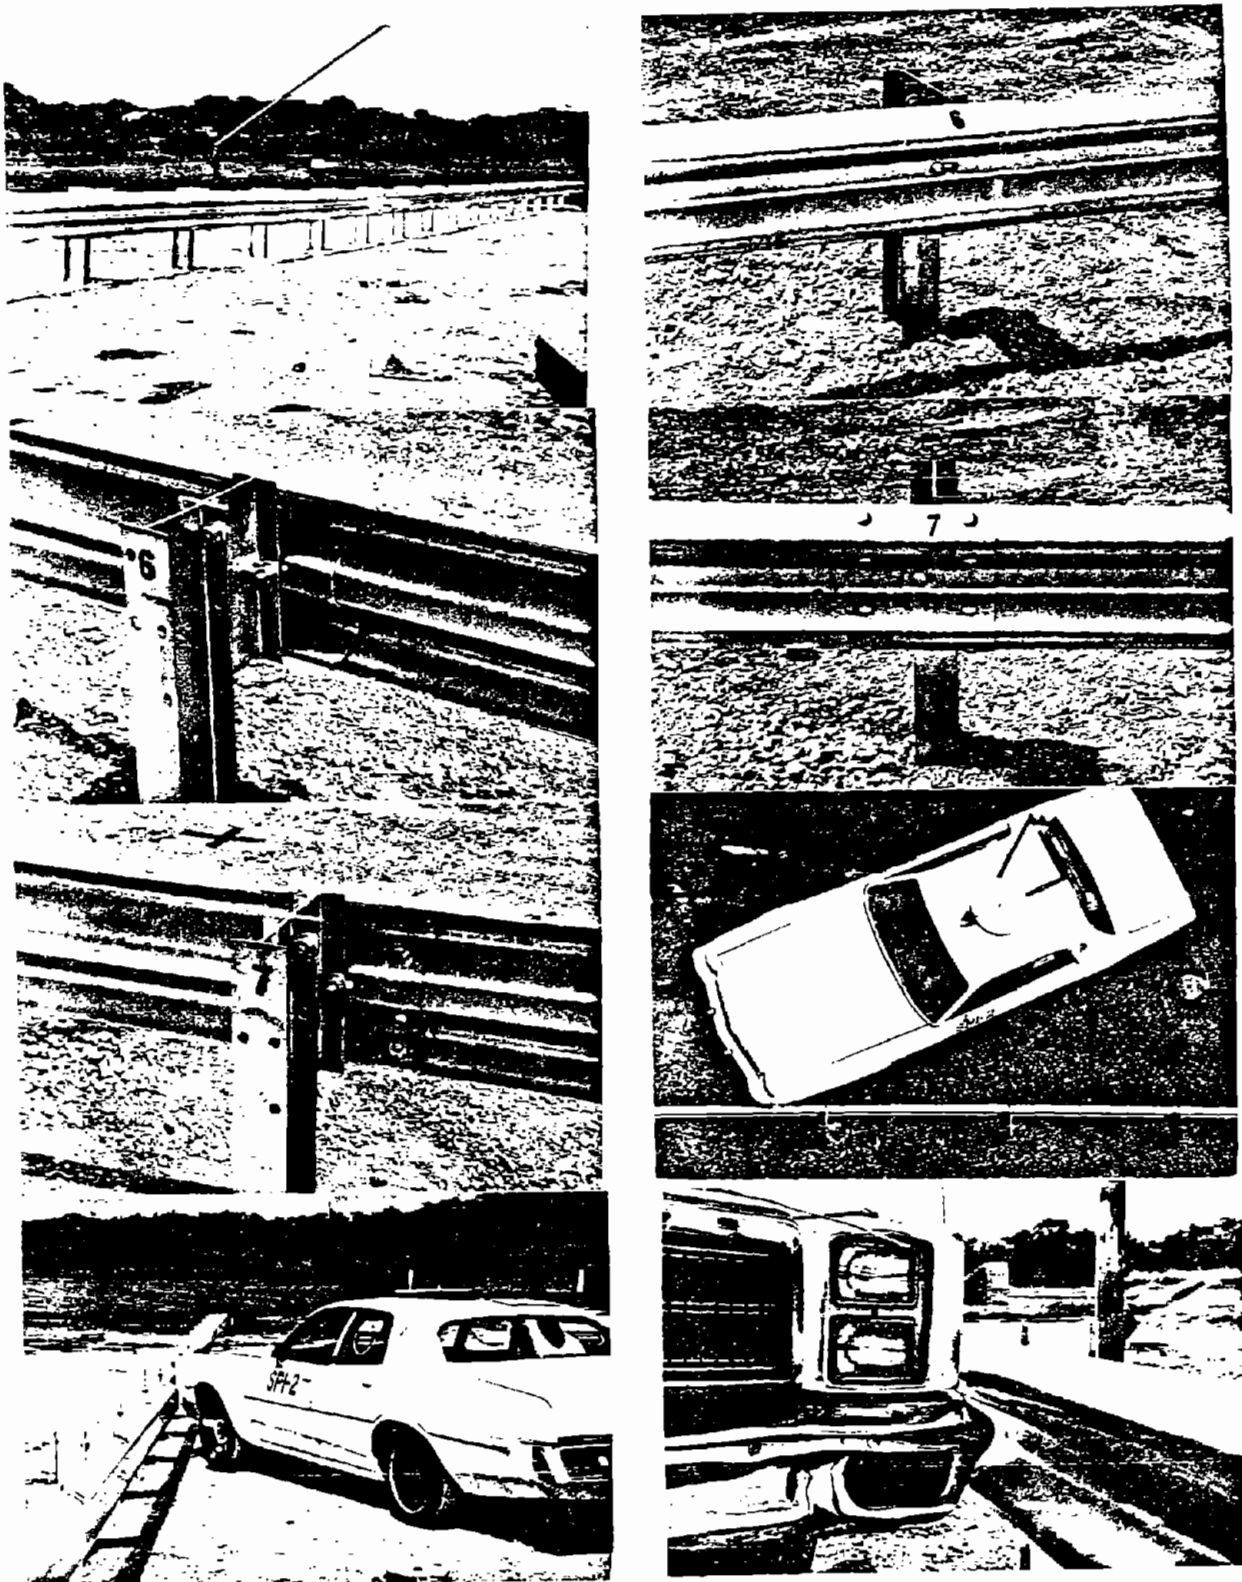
Pre-impact vehicle and barrier details, test SPI-2.
